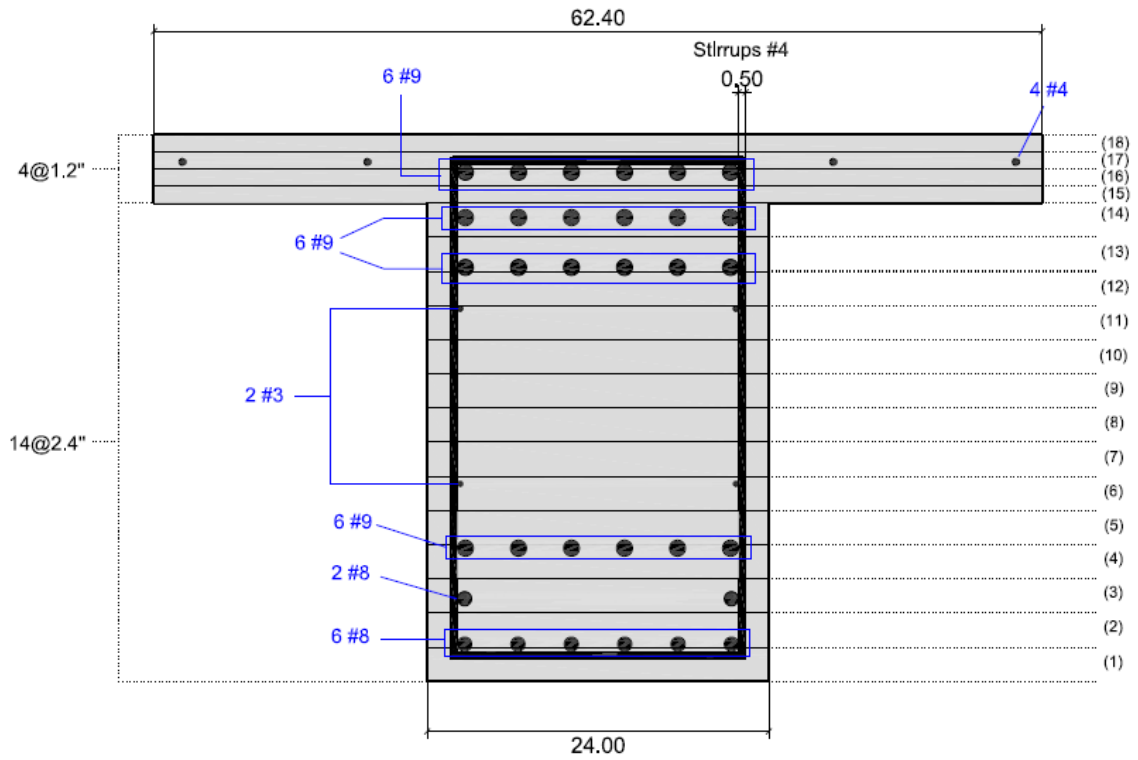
Cross section 2 for Specimen 2. Dimensions in inches.
